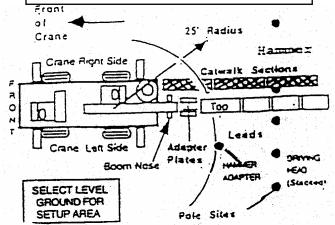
Assembly Components On Level Ground Within A 25 Ft Radius.
